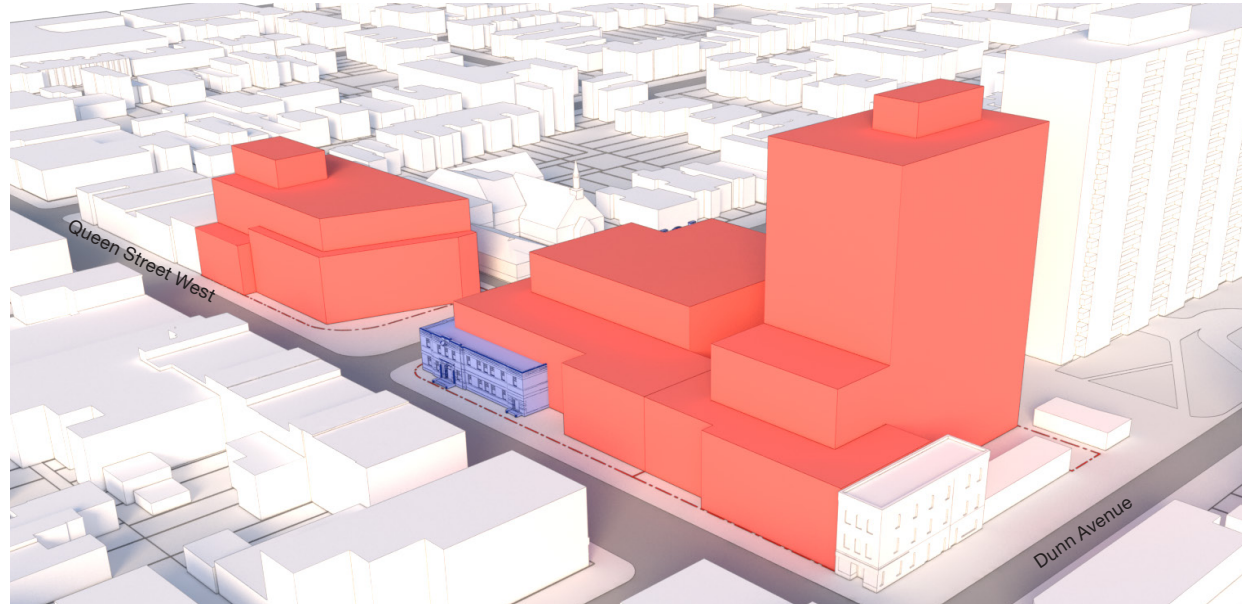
/ Massing model of Parkdale Hub looking southeast from Queen Street West. New development will reinforce the role of Parkdale Hub as a civic focal point within the Queen Street West streetscape.
